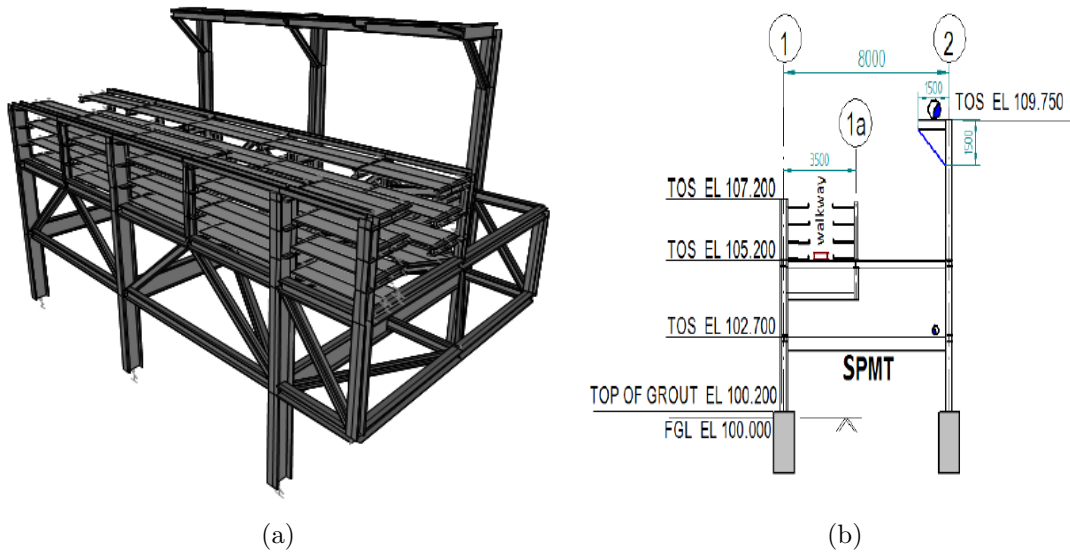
Industrial modular structures used as second numerical example: (a) 3D view; (b) elevation
